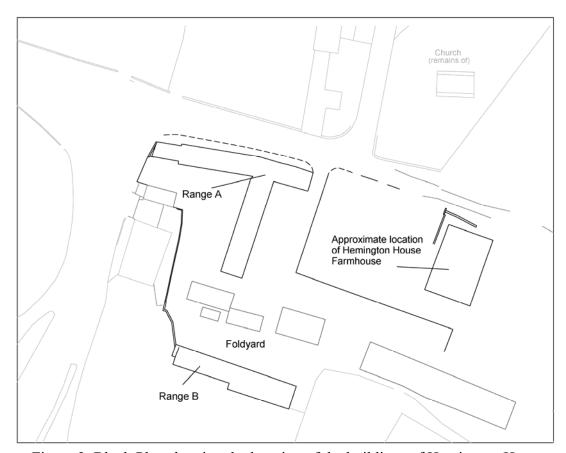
Block Plan showing the location of the buildings of Hemington House Farm. Not to scale.
